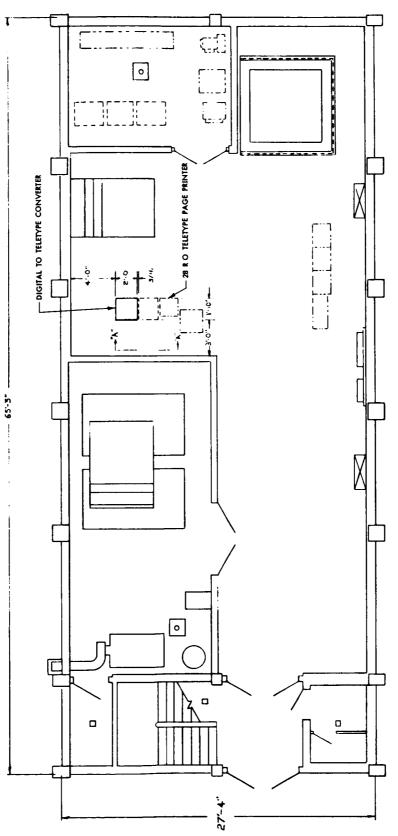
Point Arguello and Kauai FPS-16 Radar Building -Layout Diagram
